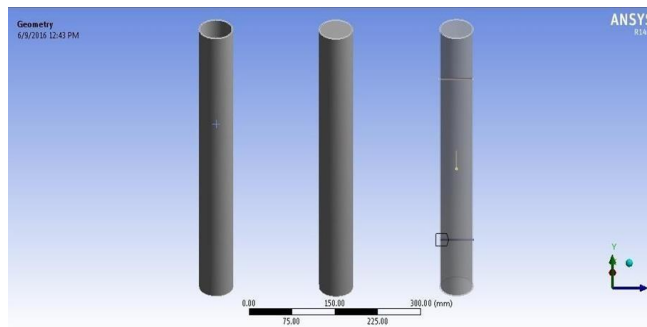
FIG V. GEOMETRY HST, CFT AND CFTT COLUMN SPECIMENS
